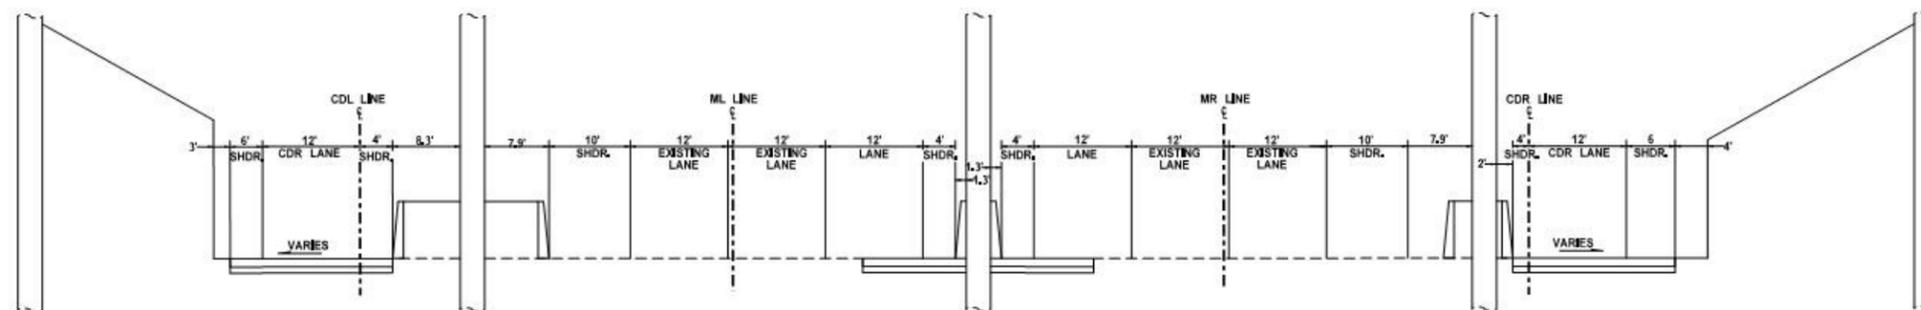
Typical Cross Section at Yakima Avenue Structure
